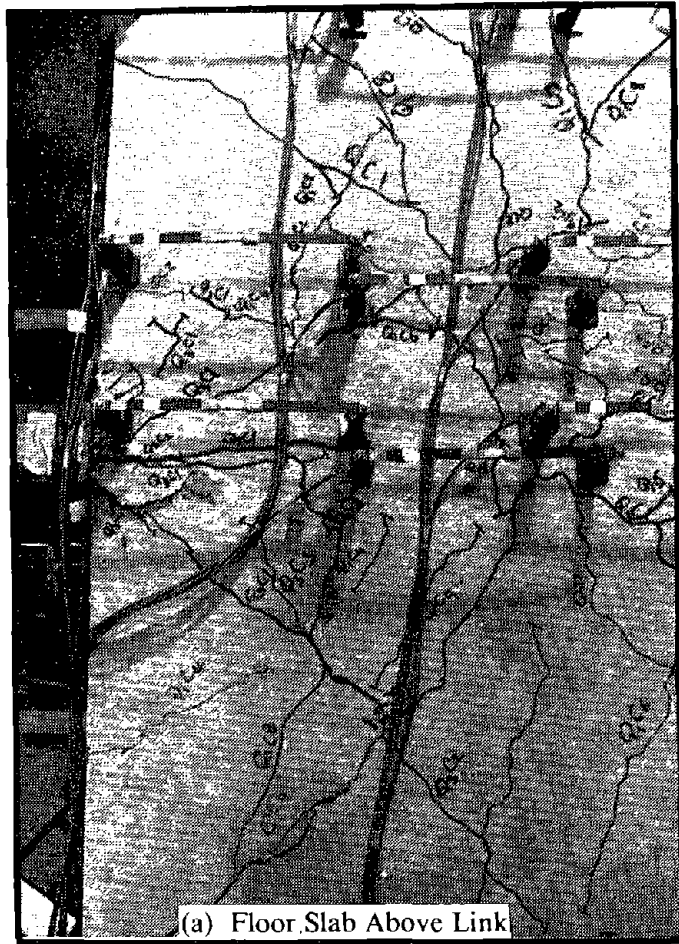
Photos of Floor Slab Damage After Test, Specimen B2.
